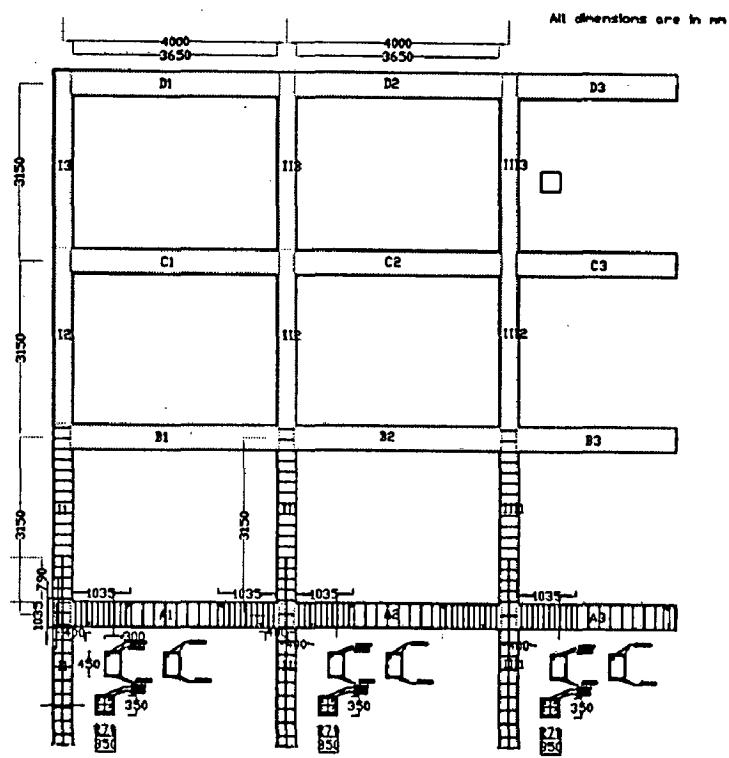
Details of beam and column reinforcement of exterior frame for Zone II
